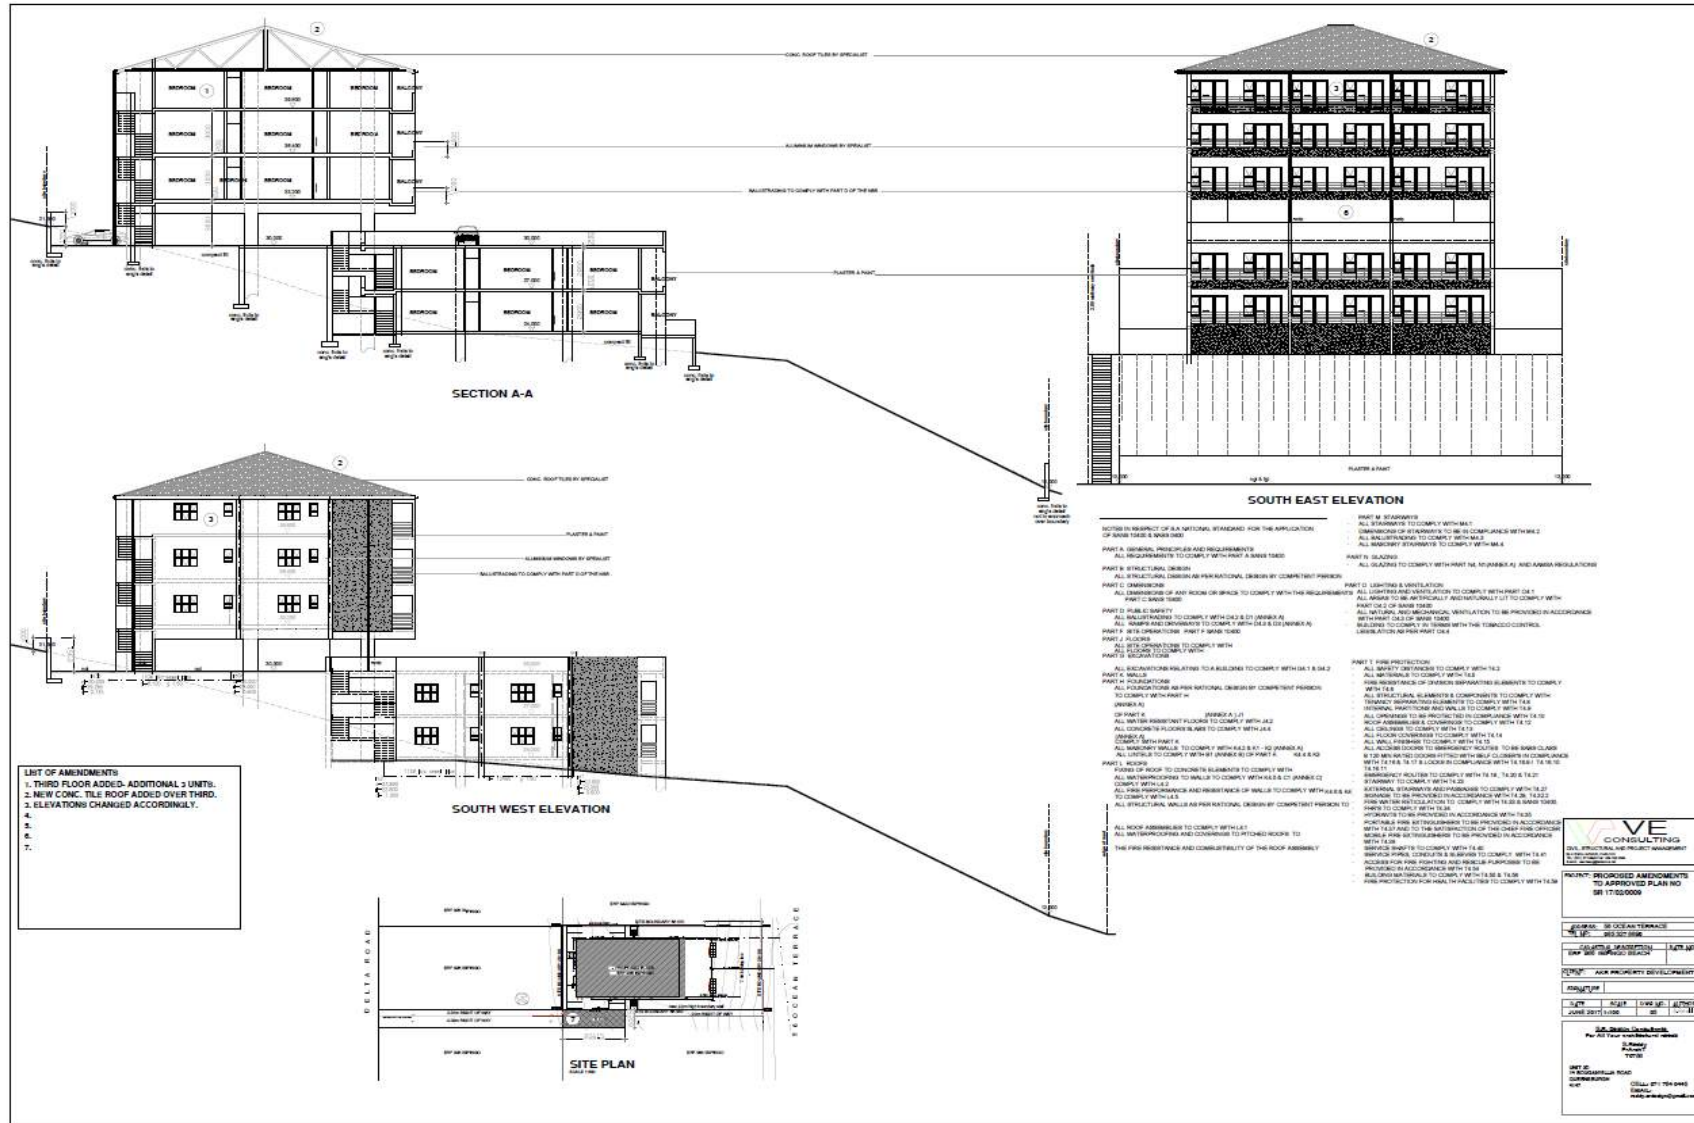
Layout 3 – Site Plan (Drawing No. SR17/02/0009)
